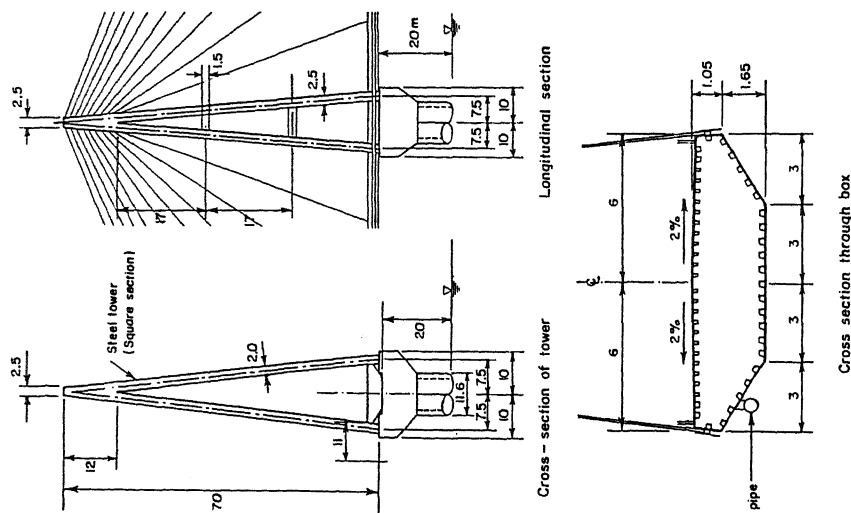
Details of pylon and deck girder of the proposed cable-stayed bridge scheme across the Jamuna River in Bangladesh.
